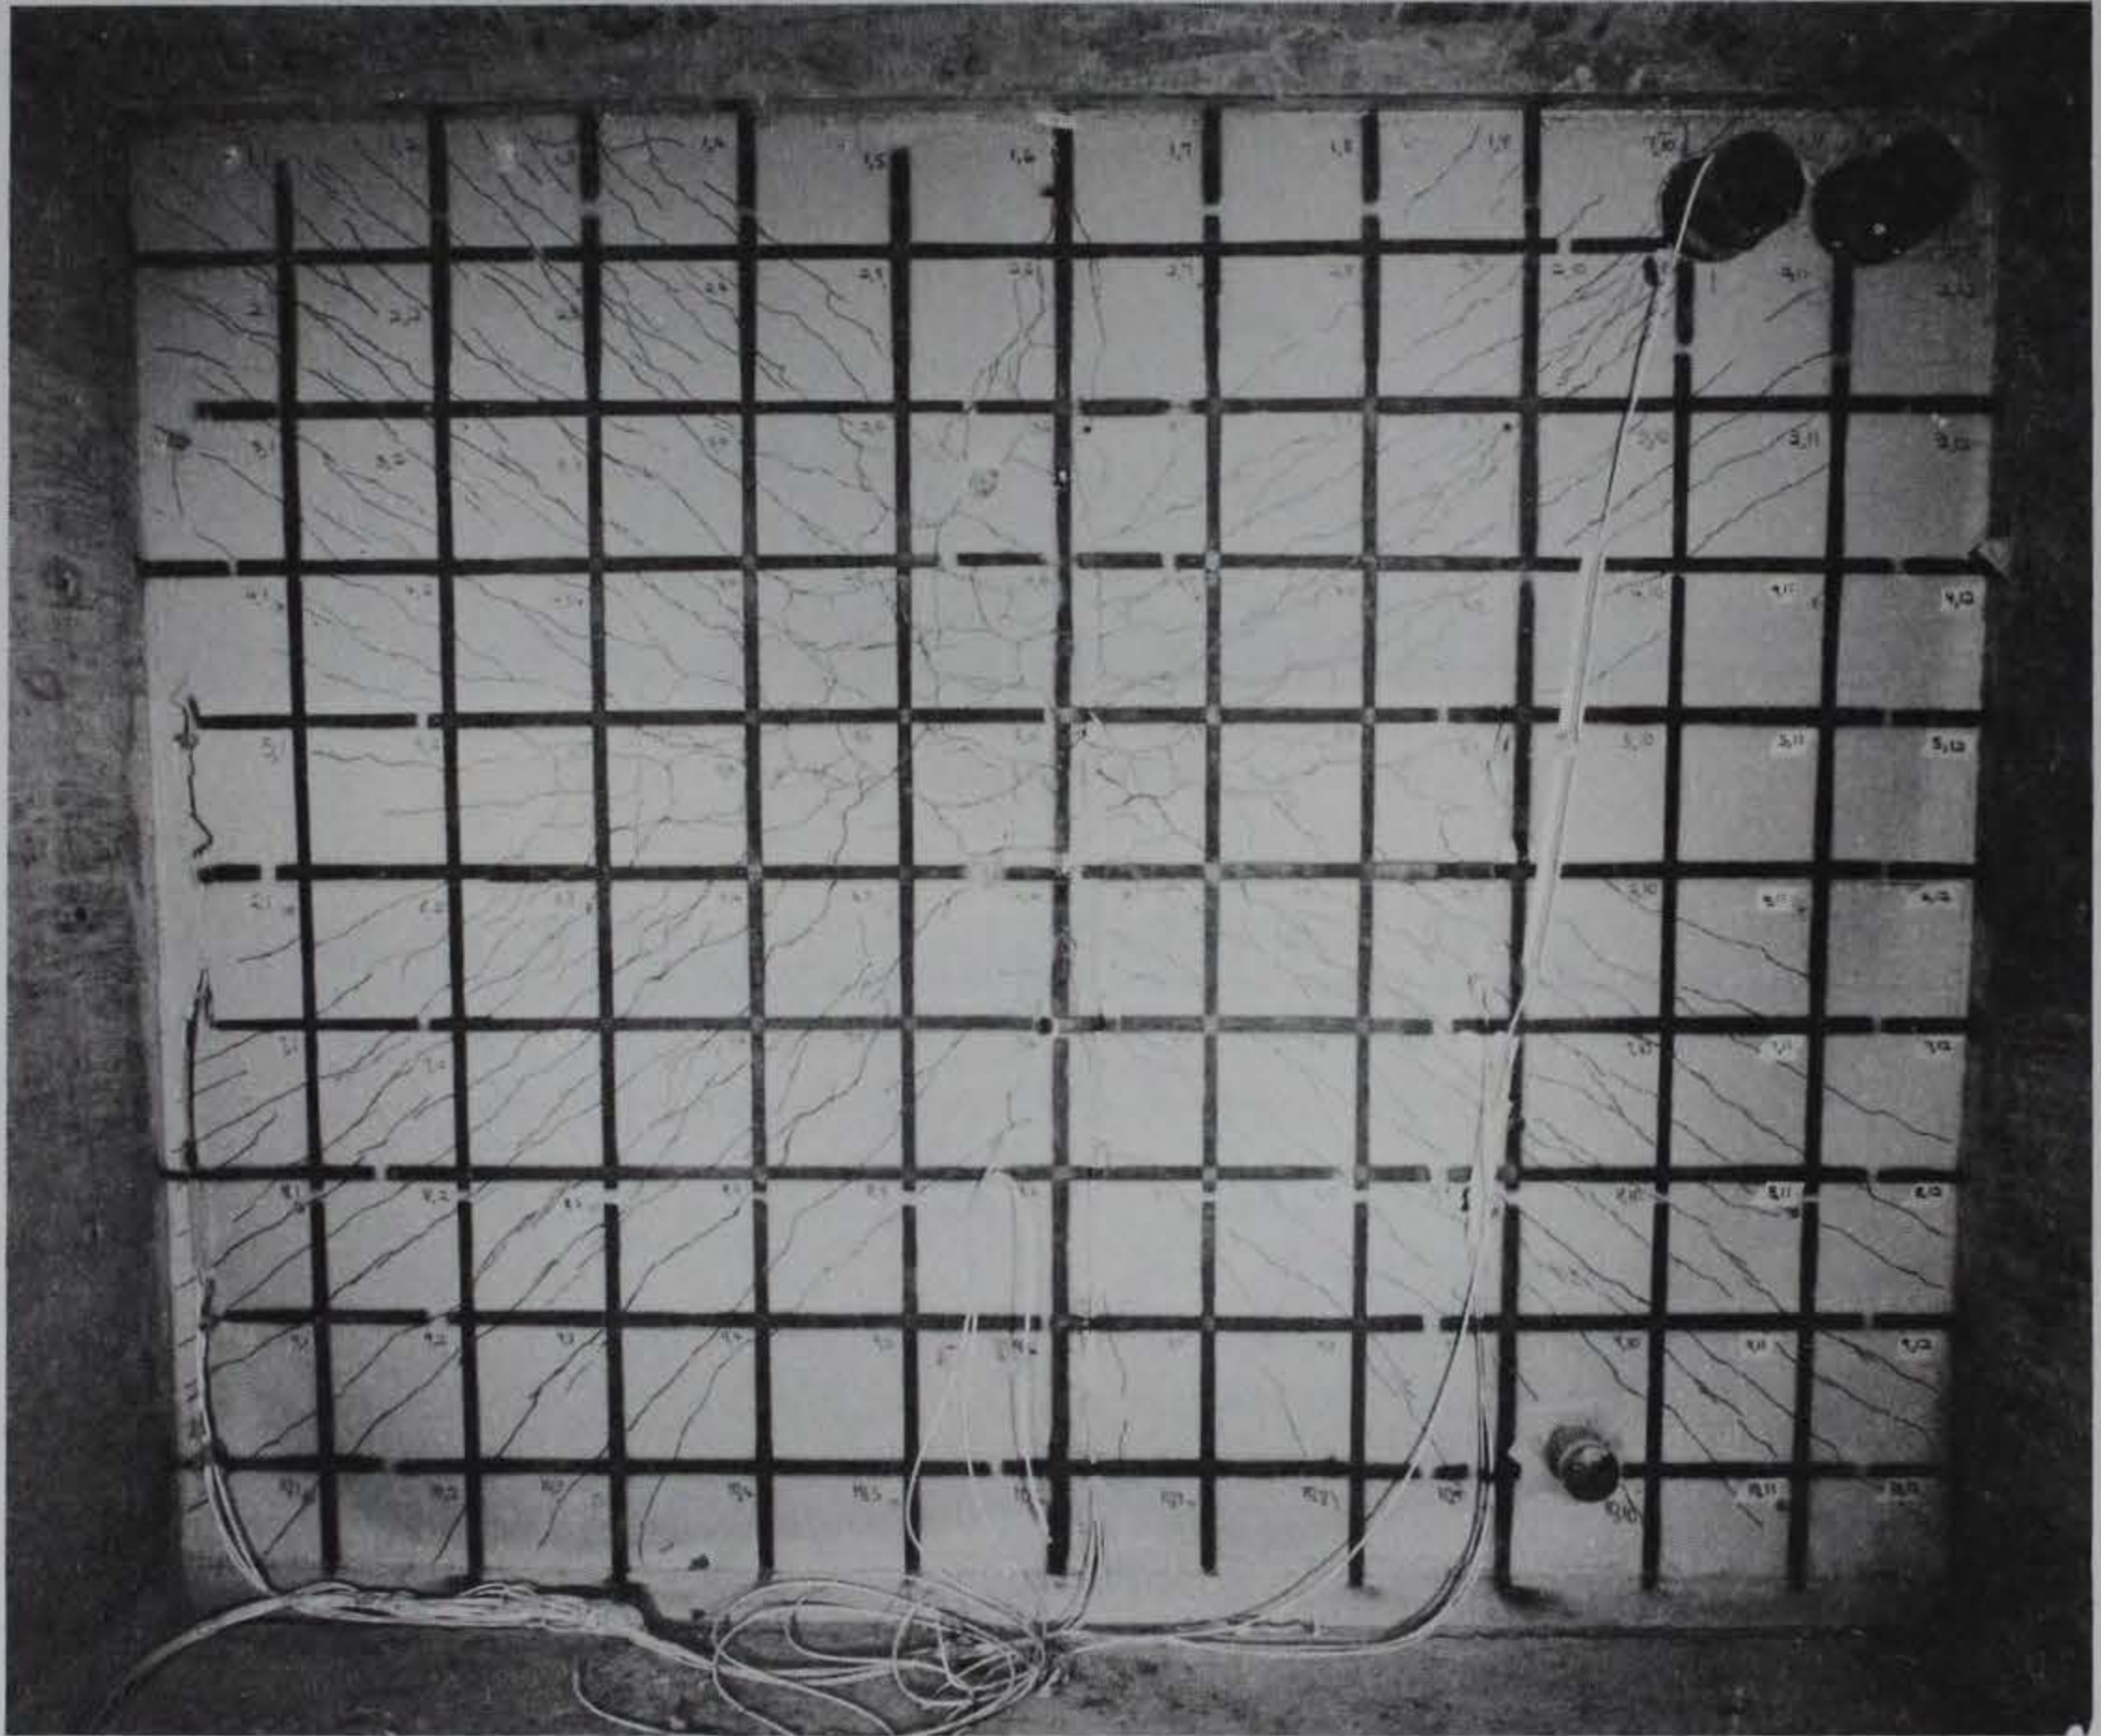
Posttest view of cracking in acceptor bay south wall.
